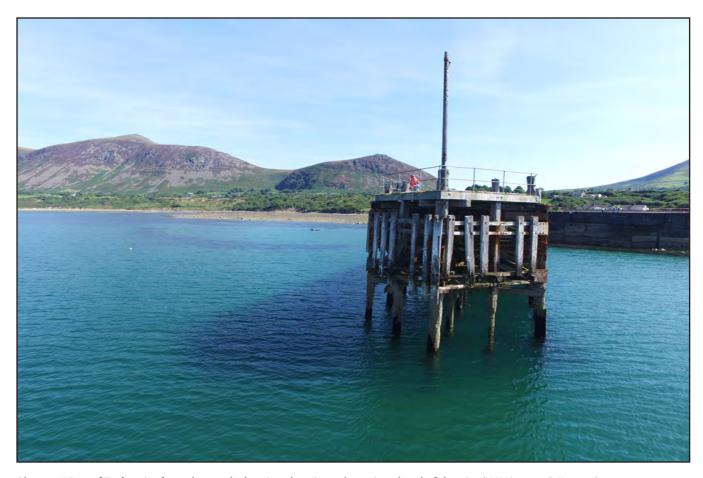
View of Trefor pier from the north showing the triangular pointed end of the pier (UAV image: DJI_0156)
